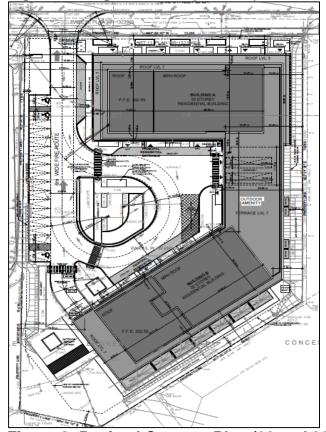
Revised Concept Plan (22 and 33 Storeys)
